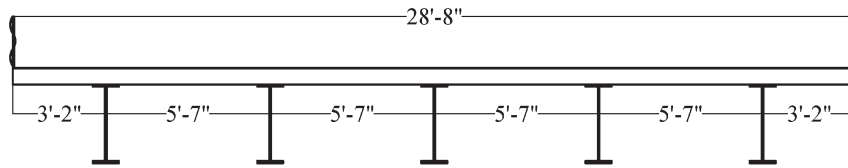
FRP deck-on-steel girder bridge cross-sections of models 1,2,3, and 4
